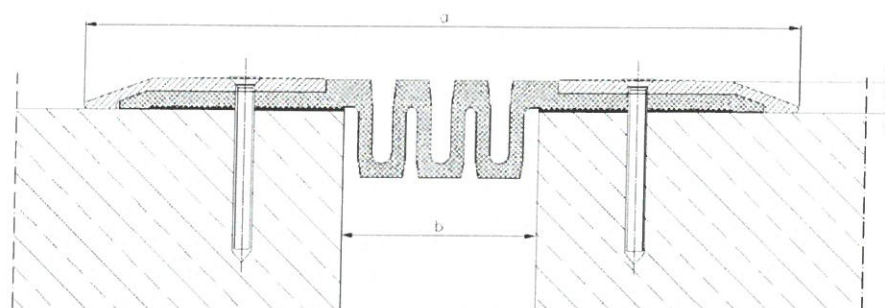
CONECTO PARK SL 230.70.N waterproof expansion joint profile – surface installation
